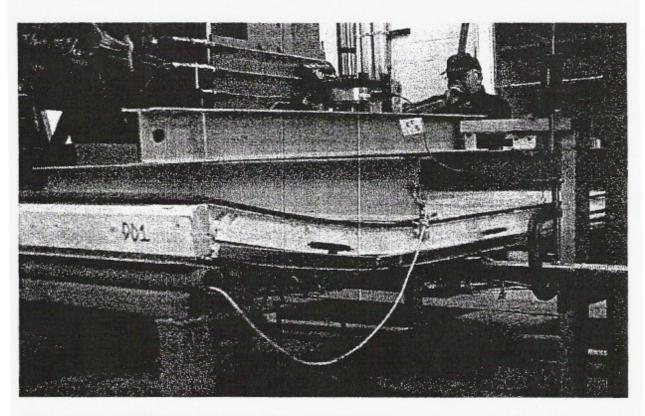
Failure of 8' OSB-OSB Panel Under Transverse Loading
